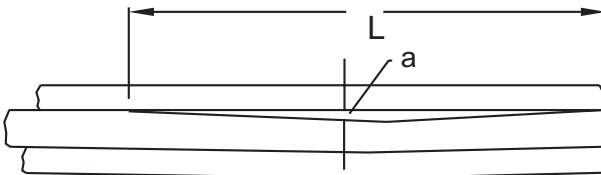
Top view of Horizontal Tolerance at Rail Ends
